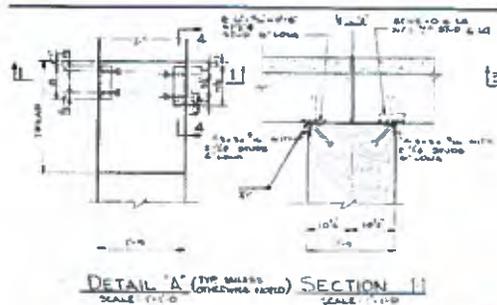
Precast Riser to Cast in Place Frame Typical Connection
